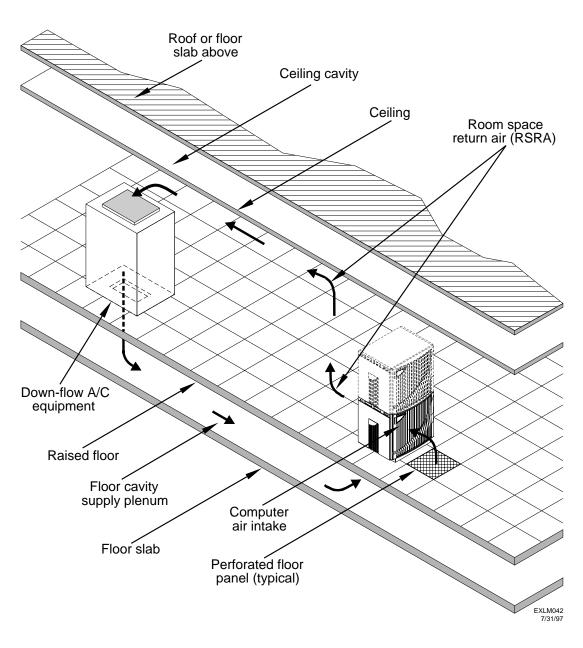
illustrates a typical computer room raised floor layout showing the general location of supply air panels.
